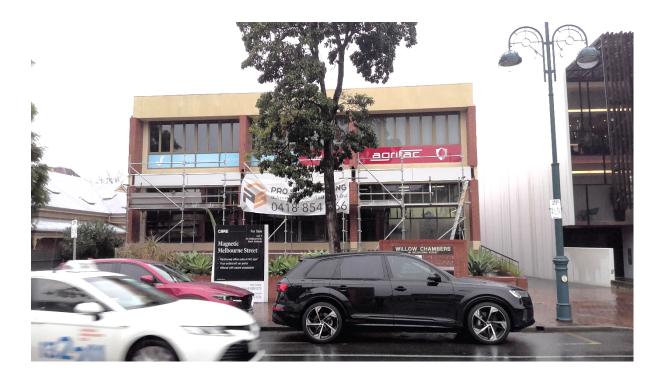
View of existing two storey building, viewed from Edith Place
